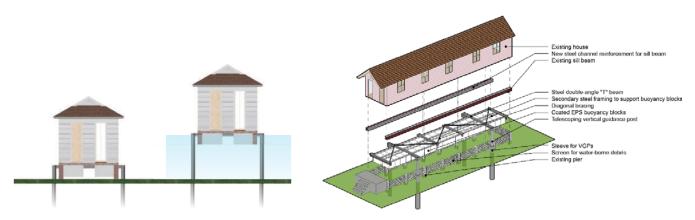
Components of a buoyant foundation. The amphibious structure provides temporary elevation when needed to prevent flood damage without increasing vulnerability to hurricane wind damage.
